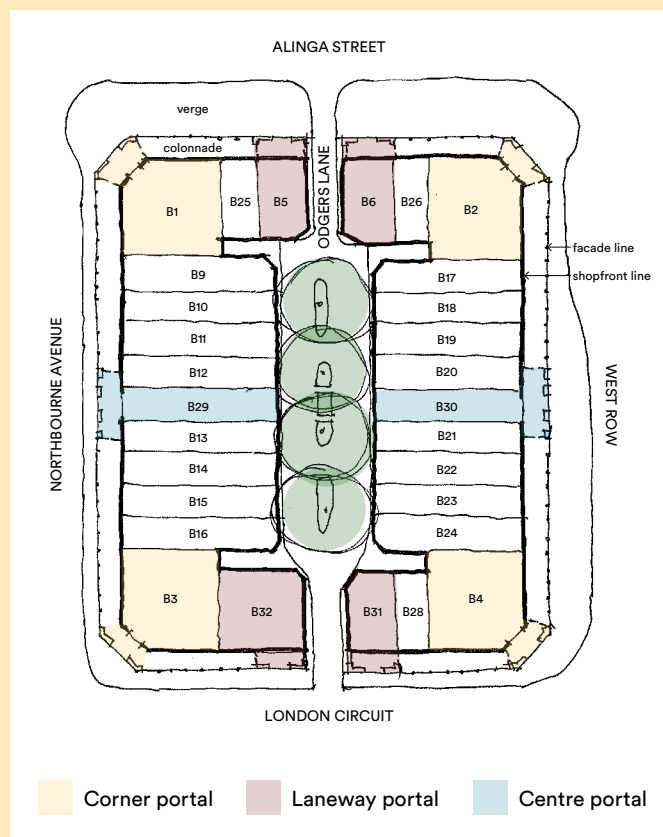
General layout plan of the Sydney Building (CMP, p. 30)
